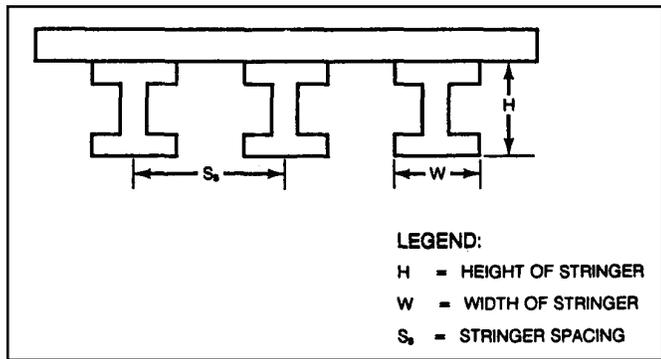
Steel stringer MLC 70 bridge with concrete deck
